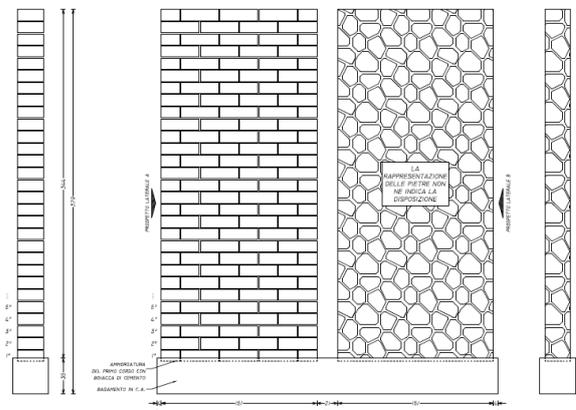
Tuff blocks wall(left) - Stones wall (right)
